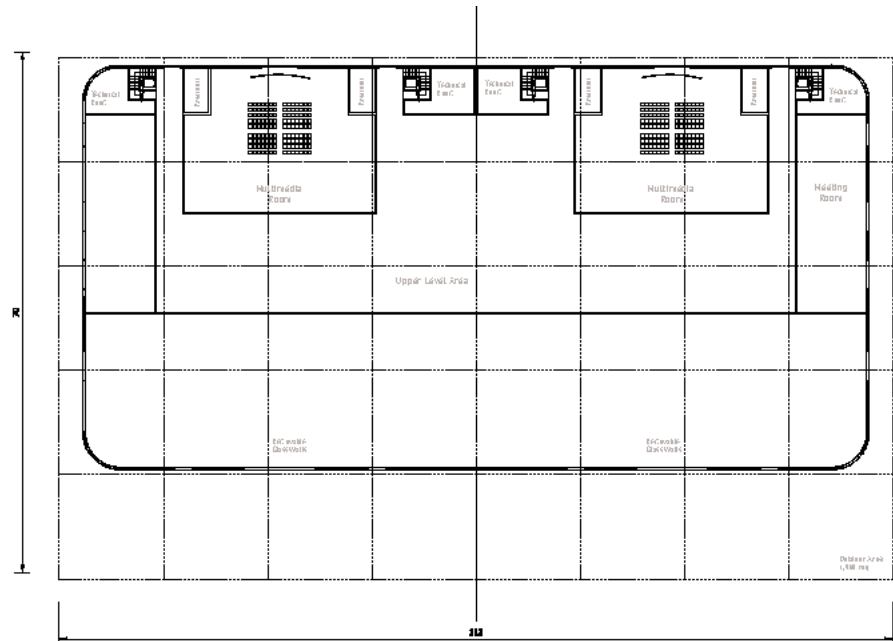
Possible Joint Pavilion (Type G) upper floor layout
